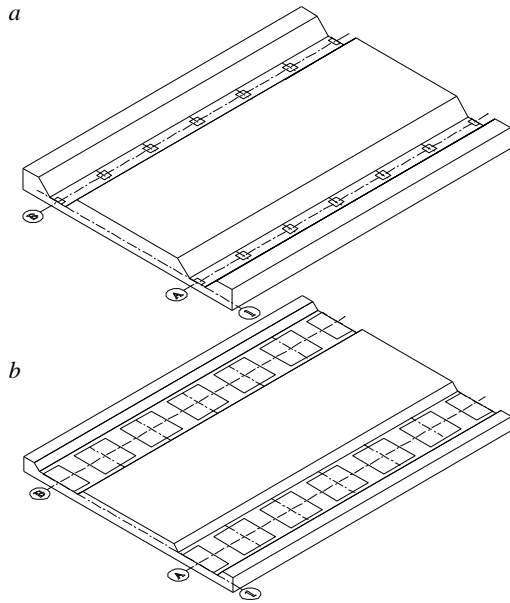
Soil excavation schemes: a- for traditional deep foundations, b- frost protected shallow foundations
